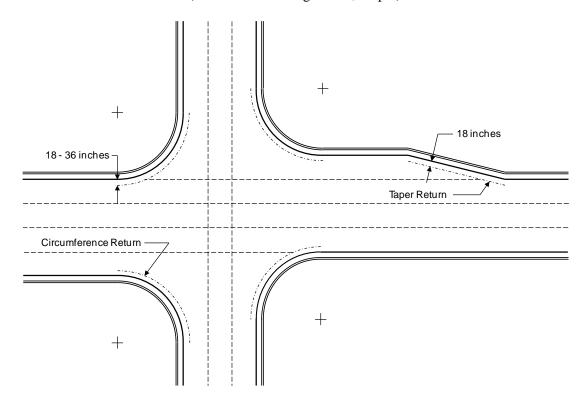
Typical Joint Layout for a Rigid Pavement Intersection (Shows Lane Configuration, Step 2)
